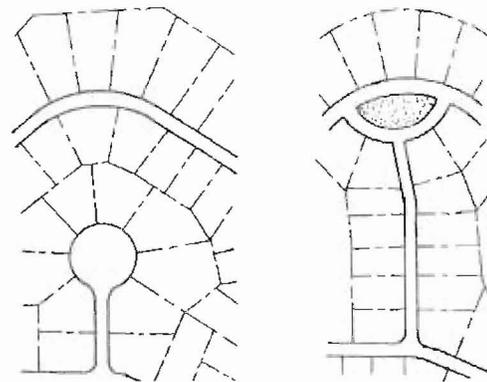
Typical cul-de-sac (left) vs. crescent layout (right). The crescent design (right) has the advantage of several stop signs, reduced driving speed, and discouraged through-traffic. Source: APA/PAS Report 487/488, Crossroads, Hamlet, Village, Town: Design Characteristics of Traditional Neighborhoods, Old and New.
